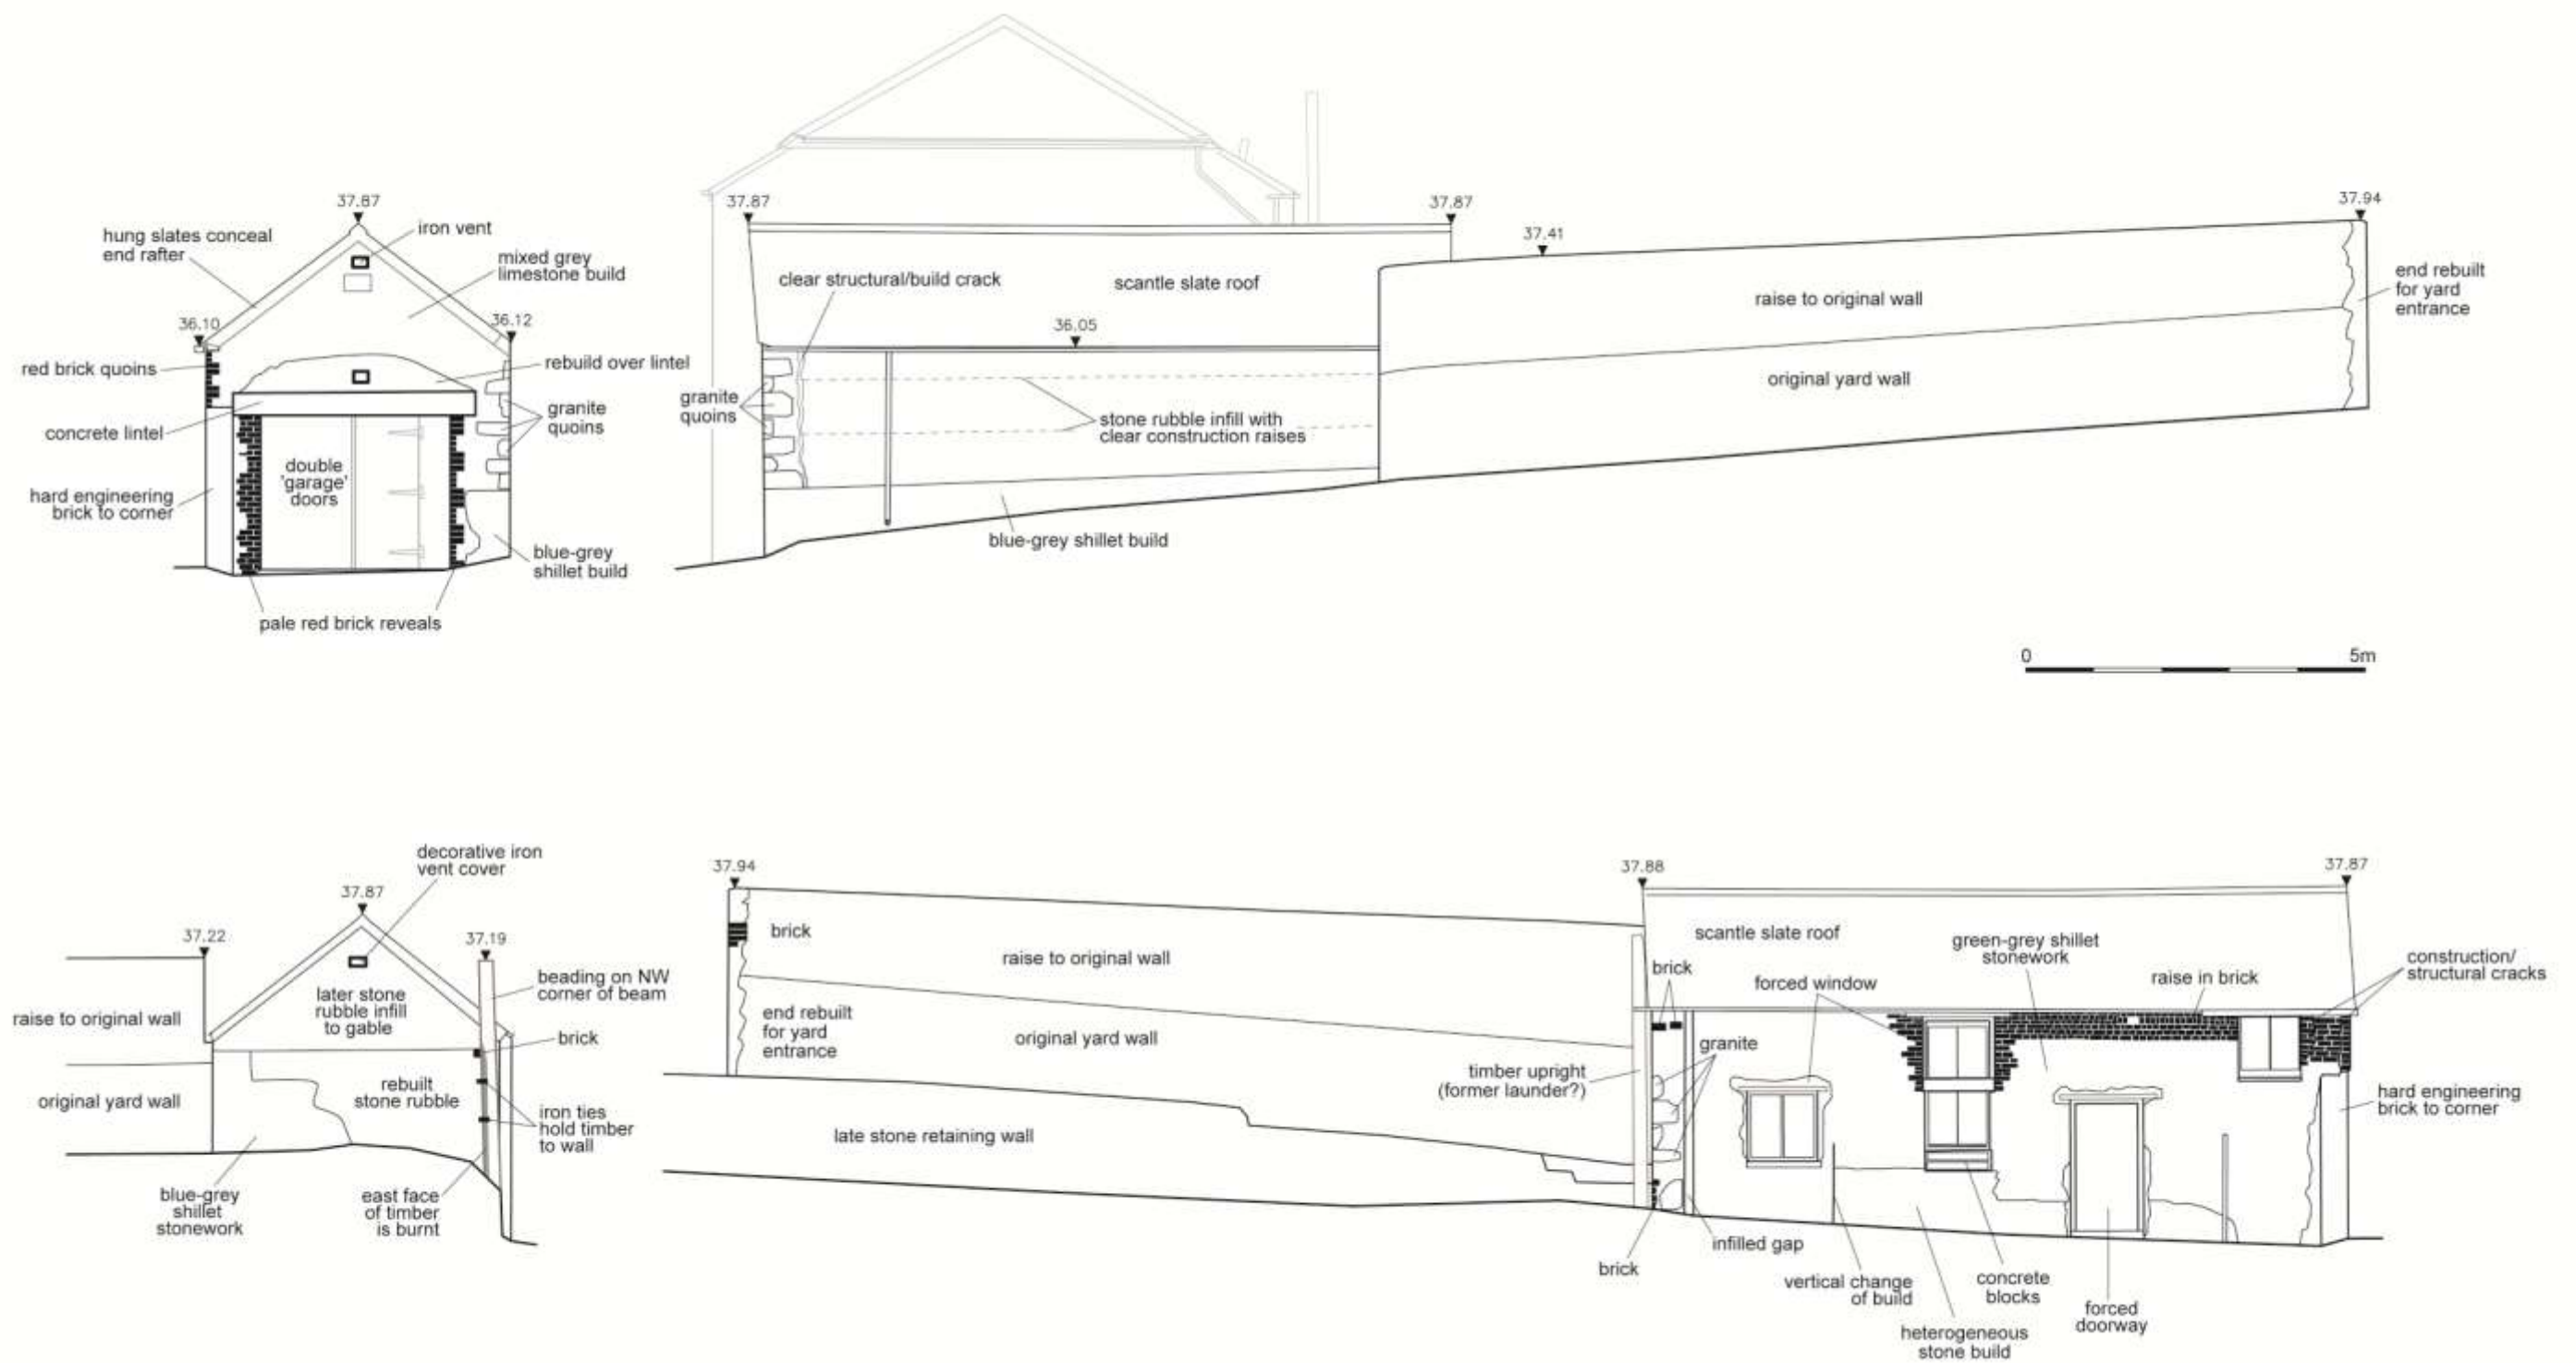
Elevations of B2 and the yard wall (based on supplied drawings).
